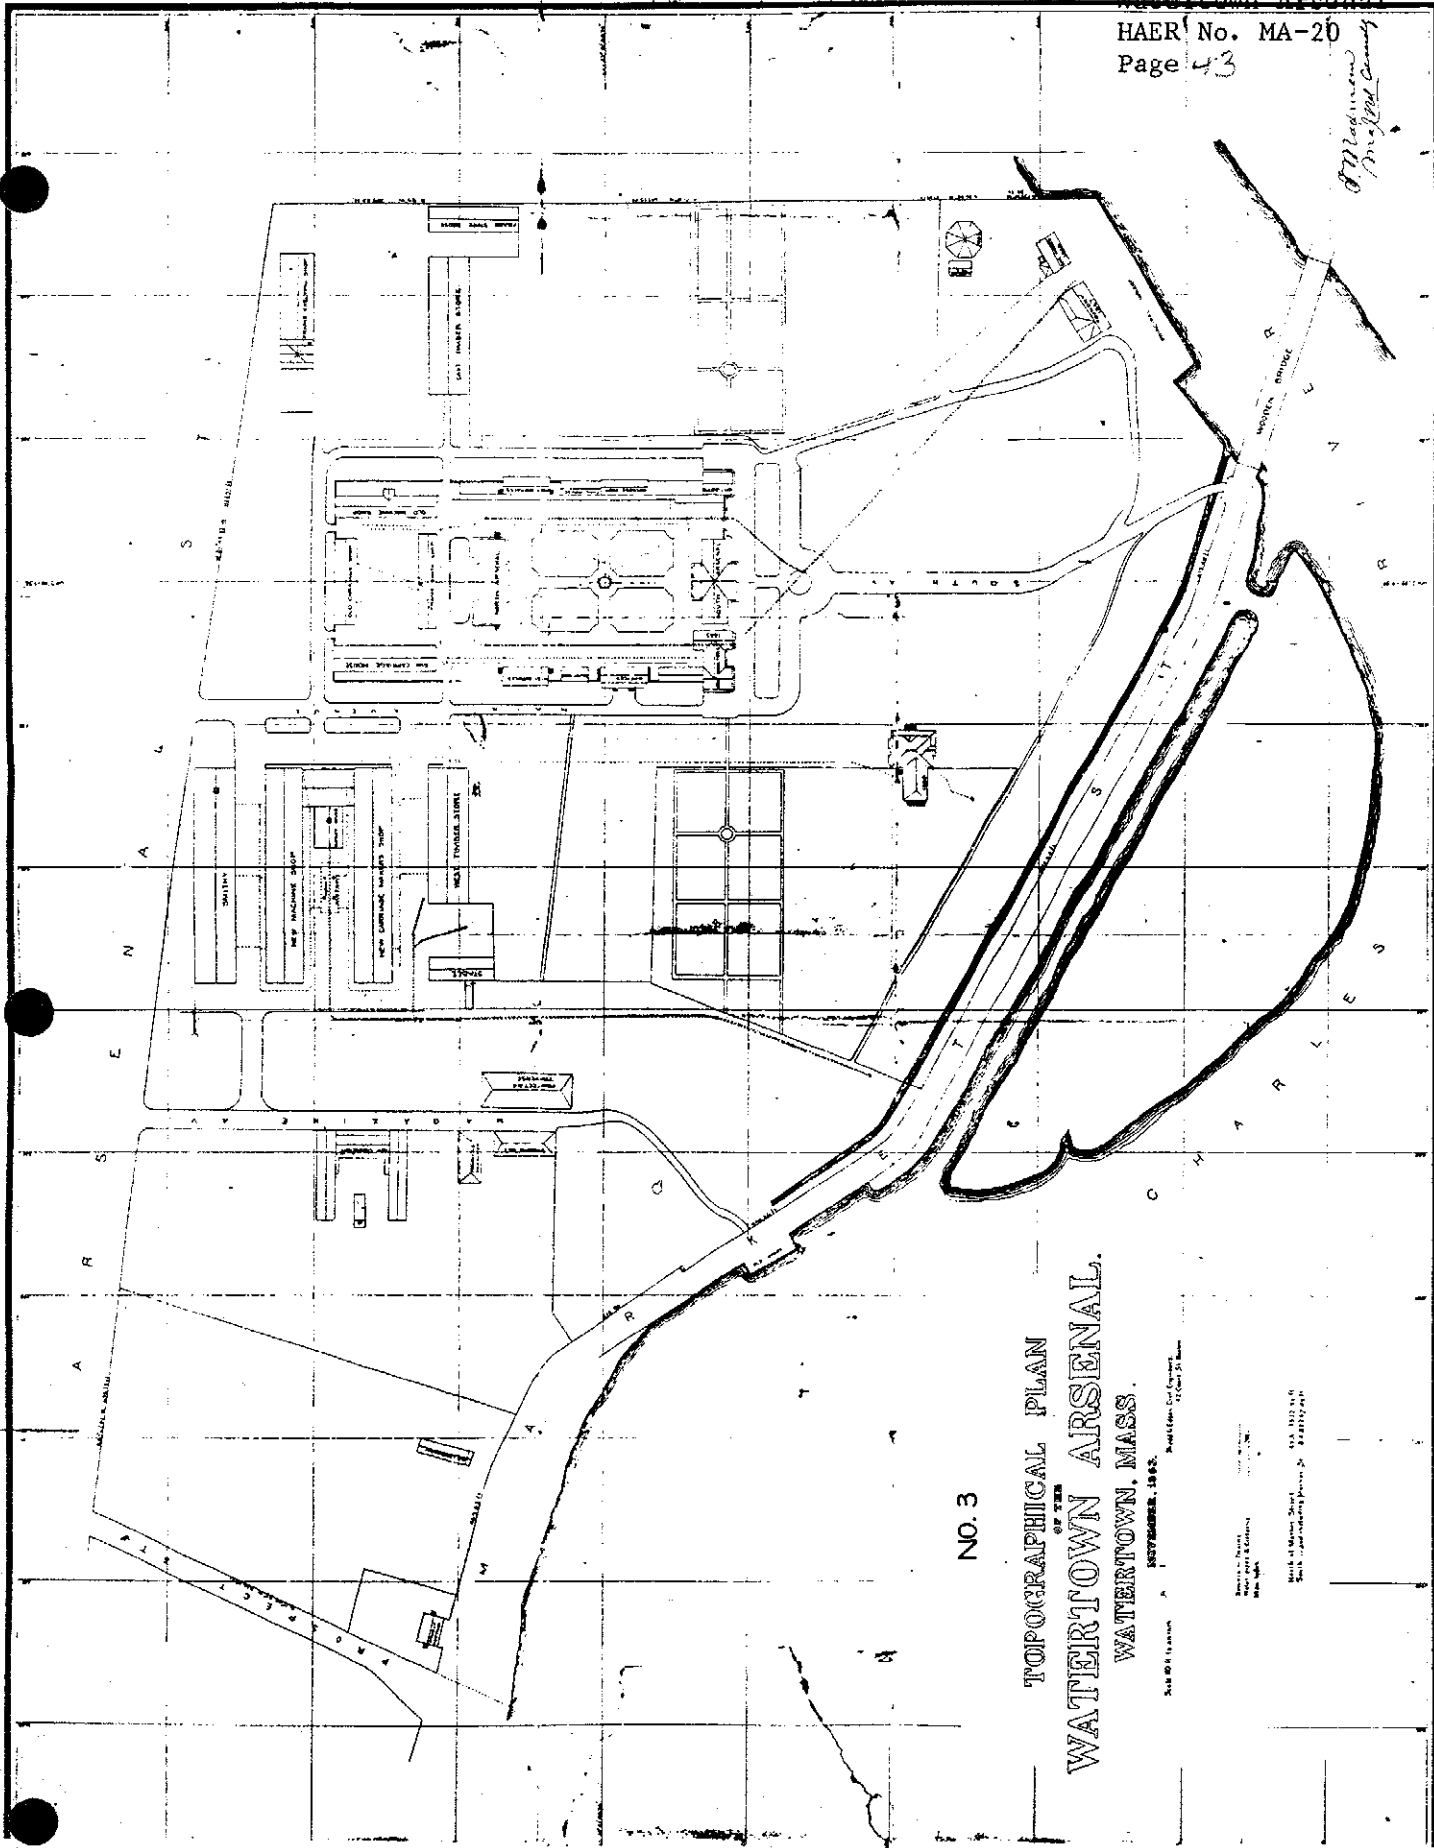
1863 Plan of the Watertown Arsenal. (Public Affairs Office, AMRC)
